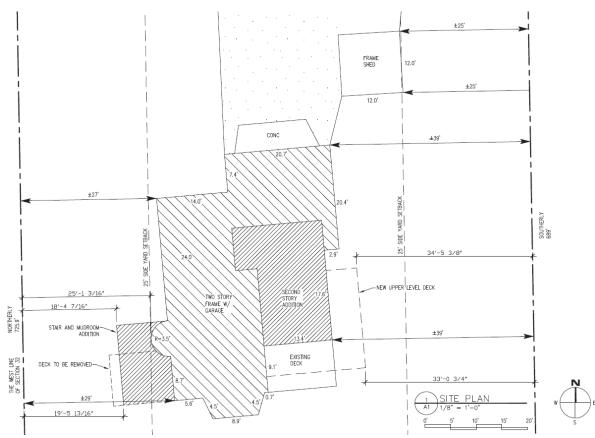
Applicants' proposed site plan, including proposed additions on the western building façade as well as a proposed second-floor addition
